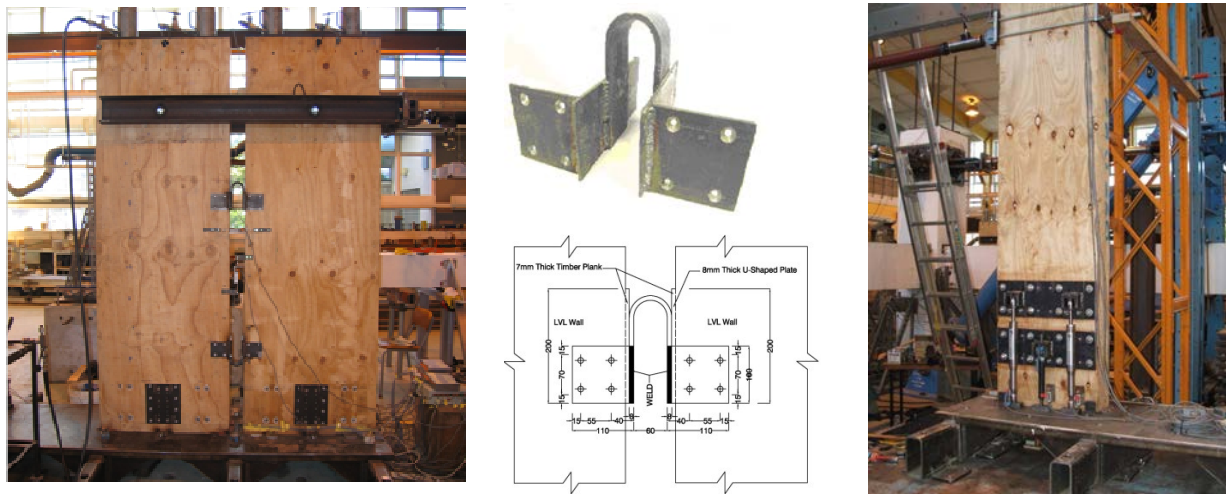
Left and Centre: Pres-Lam coupled walls with U-shape Flexural Plates dissipaters (Iqbal et al., 2007); Right: shake table test on Advanced-Flag-Shape Pres-Lam wall (viscous and hysteretic dampers in parallel), Marriott et al., 2008)
